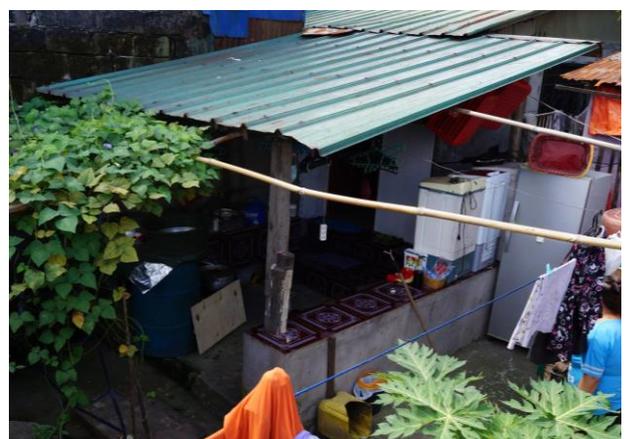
& 58j. Poor quality block layout on concrete hollow block houses
